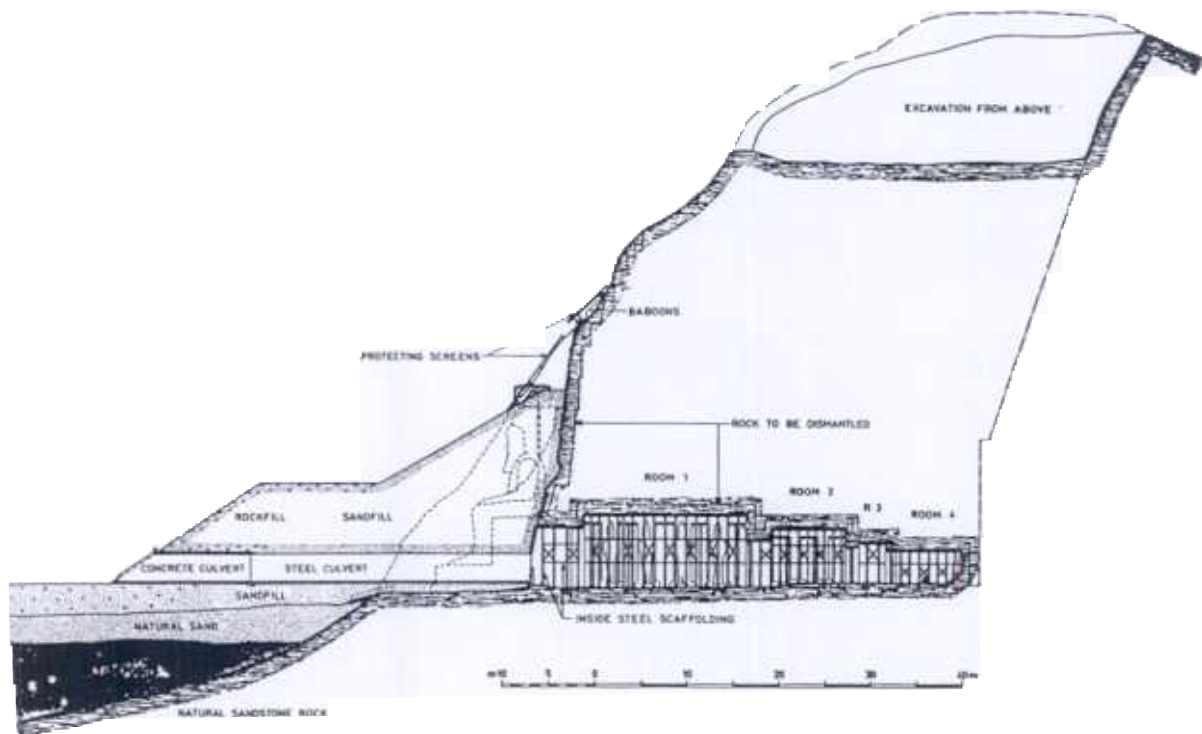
Various preparatory and protective works were executed for the excavation of the rock above the temples, such as sandfill in front of the façades, provisional access culverts to the interior of the temples, protection screens above certain upper parts of the Great Temple façade, steel scaffolding inside the temple rooms for the support of roofs and walls until they were dismantled, etc. (Cf. also Figure 12)
